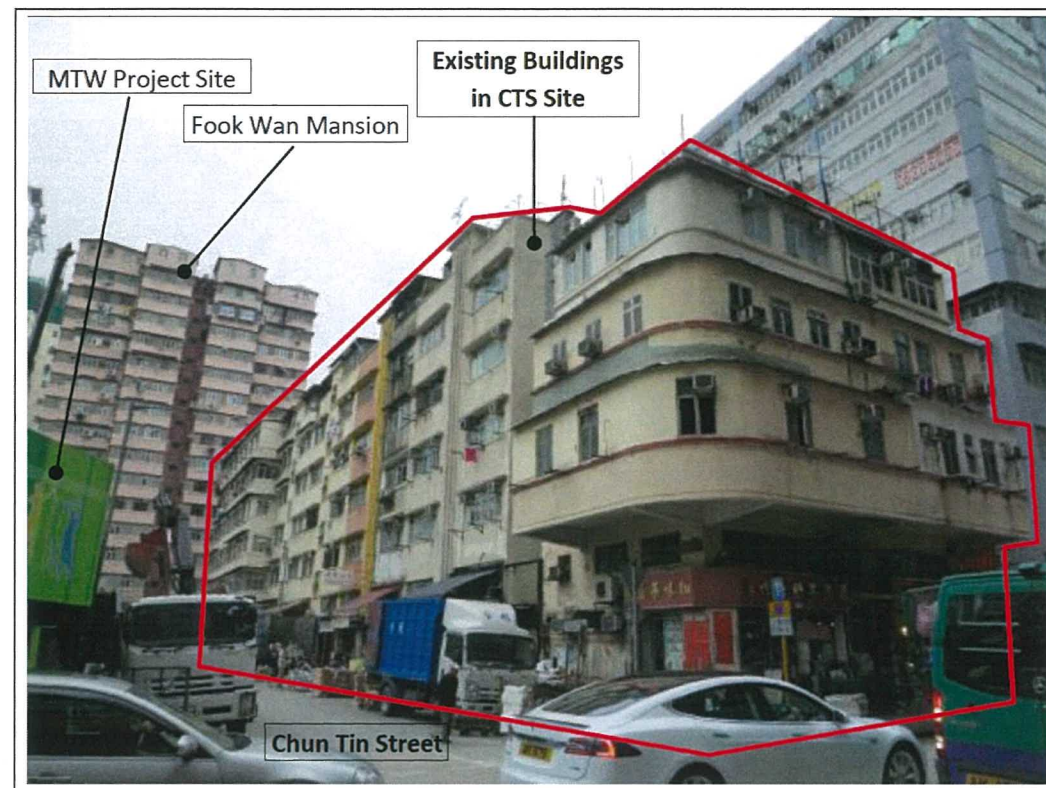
Ma Tau Wai Project (MTW), Existing Old Buildings on Chun Tin Street (CTS), Fook Wan Mansion and Chun Tin Street, View From Hok Yuen Street
